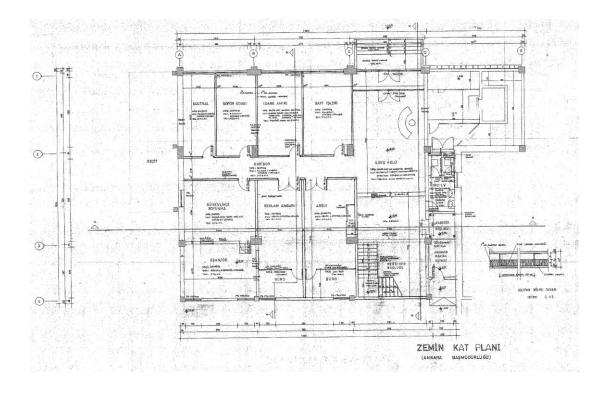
Drawing of the malt building drawn for the repairing in 2001, Ground Floor Plan
